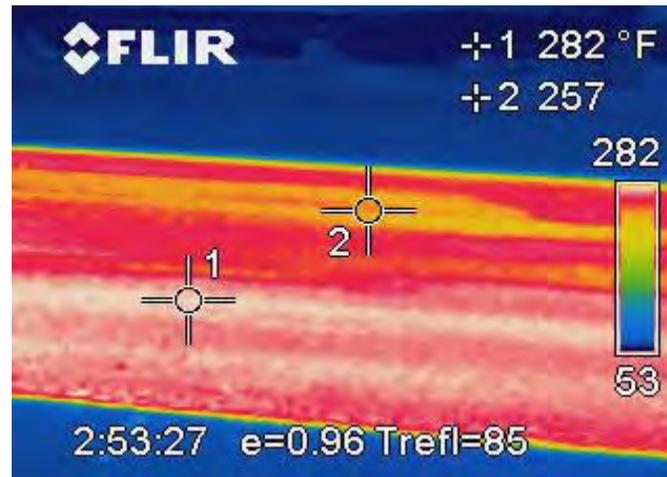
Image of cool spot where paver paved over remaining mix on roadway.
